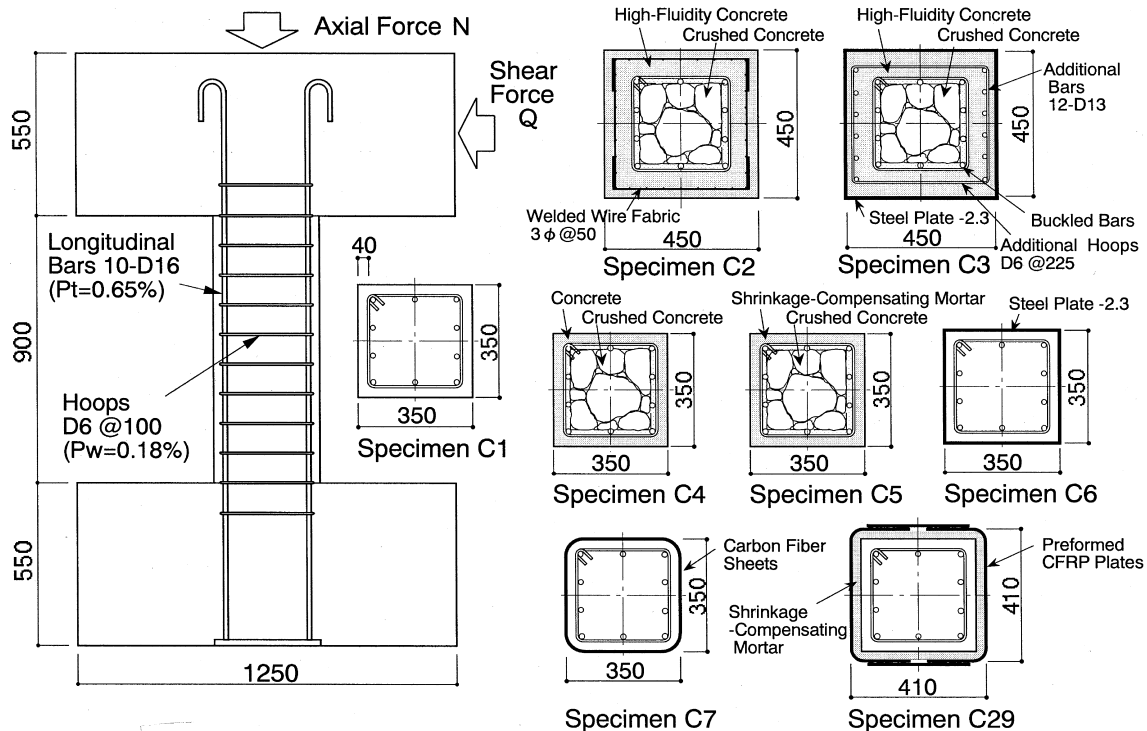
The cross-sections of specimens and shapes (units; mm).
